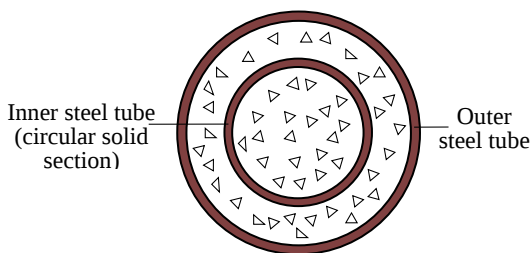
Cross-Section of column with concrete-filled double-layer steel tubes (CFDLT)
